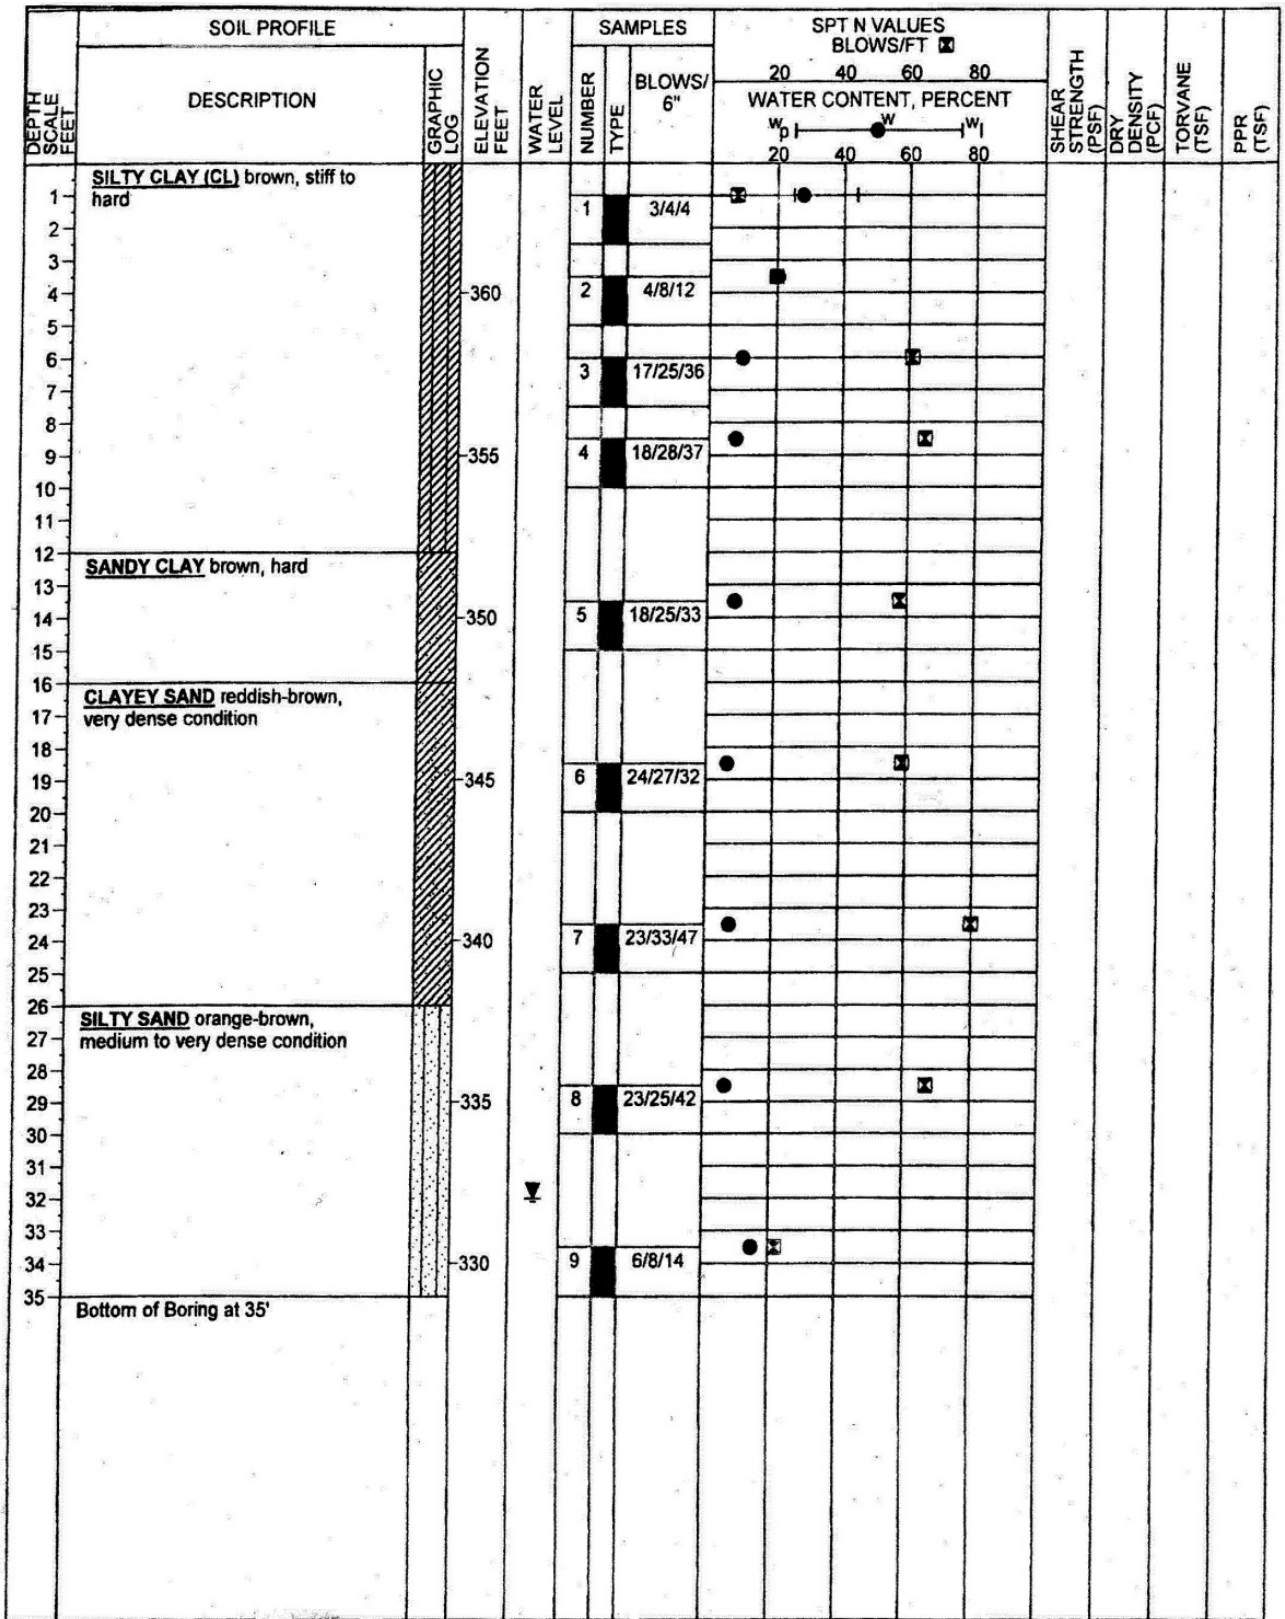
Soil profile at the site of the hospital building (courtesy of Geotechnology, Inc).
